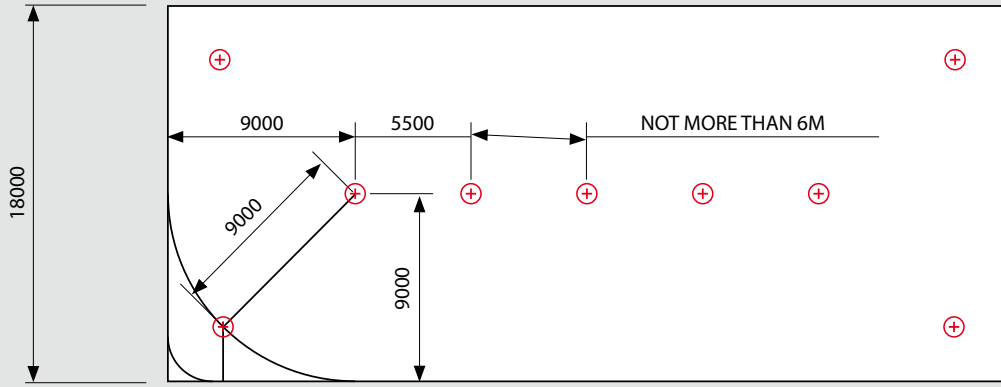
Roofs up to 20 metres in width implement the standard anchor positioning as shown
